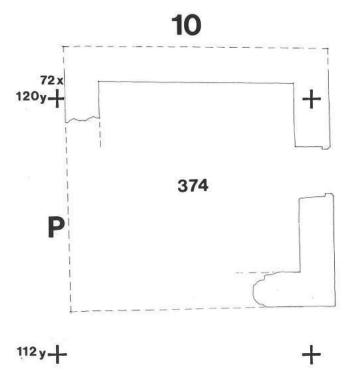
Plan of the stone «cellar», Building 374, in Engelgården North with its entrance to the south.
